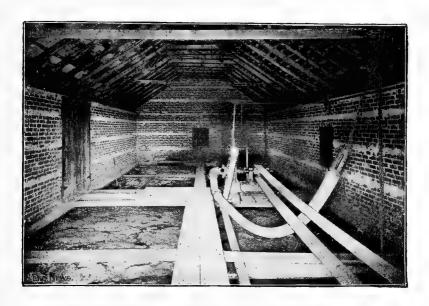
Interior of Champaign, Ill., Covered Septic Tank.
